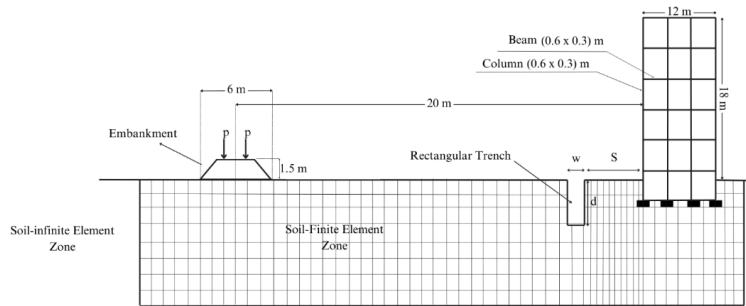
Model geometry showing embankment, trench, soil domain, and building layout
